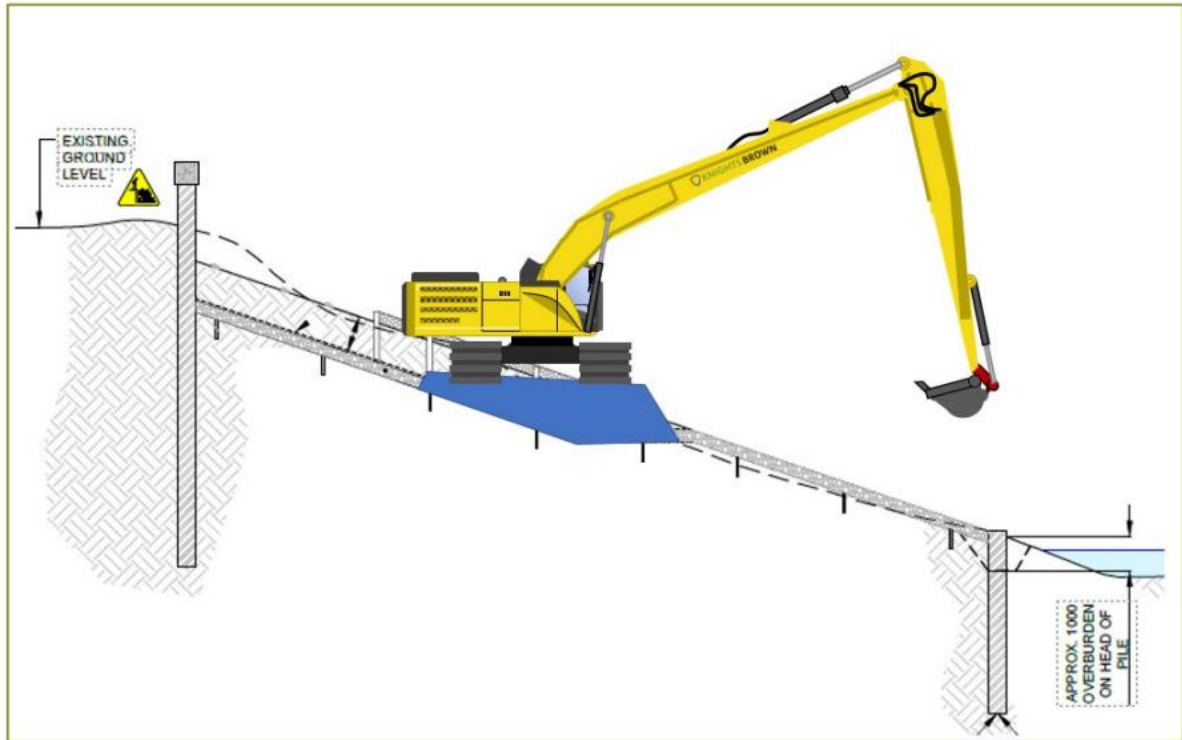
Construction methodology for location 32 (note toe piles no longer proposed within the channel but a rock trench)
